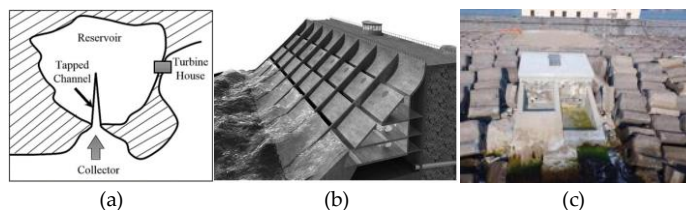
Examples of OWEC: (a) Top view of TAPCHAN [12], (b) Cross-section of SSG WEC [30], (c) Frontal view of the OBREC [13].
